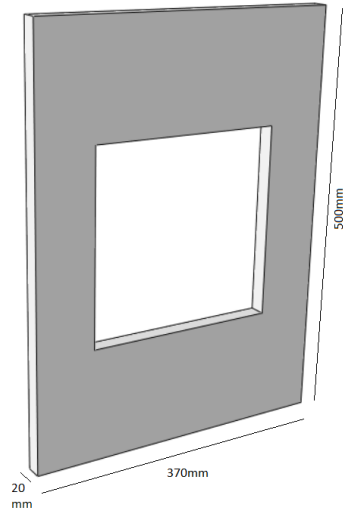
UHPC layer around the opening dimension (370\*500\*20&30mm)
